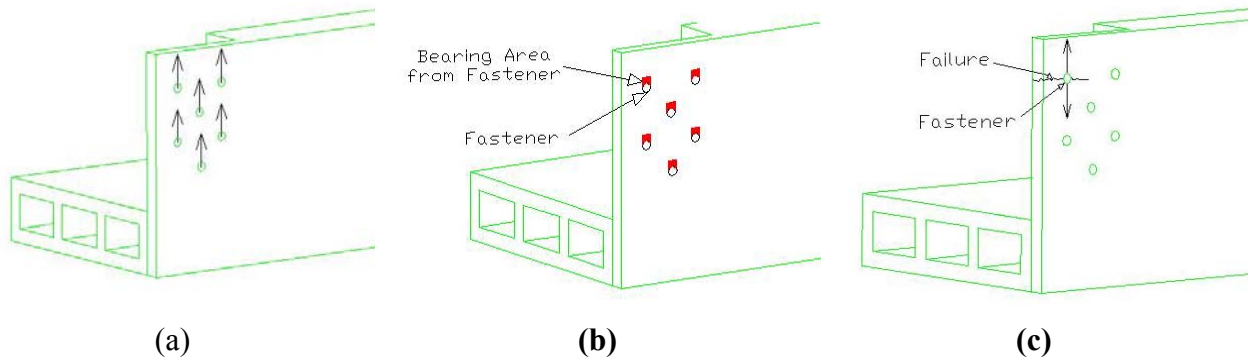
Connection forces: (a) End stud connection force direction, (b) Bearing on sill plate from fasteners, (c) Tension perpendicular to extrusion from upward force of fastener
